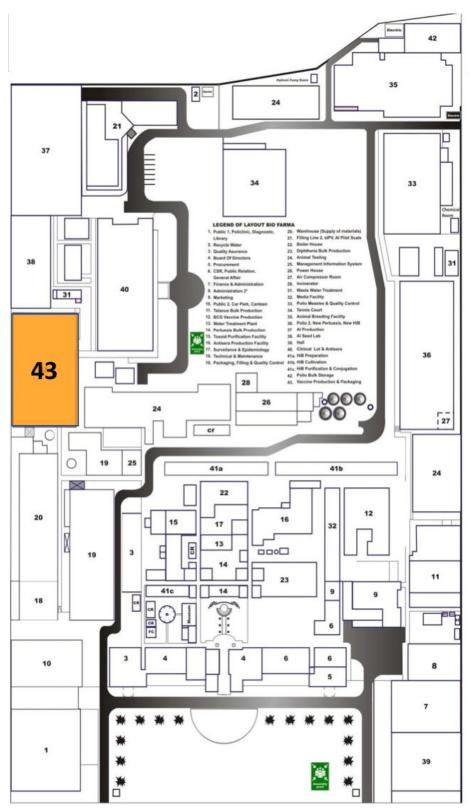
Plant Layout of Bio Farma's Bandung site, location of Building 43 (all buildings are existing)
